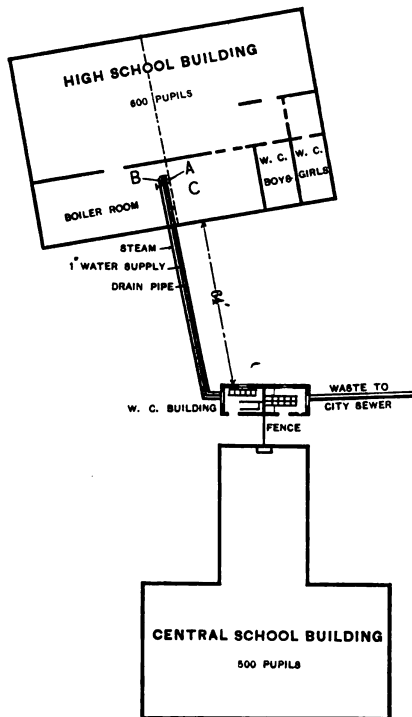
Plan of School Grounds, Showing Closet Building.
